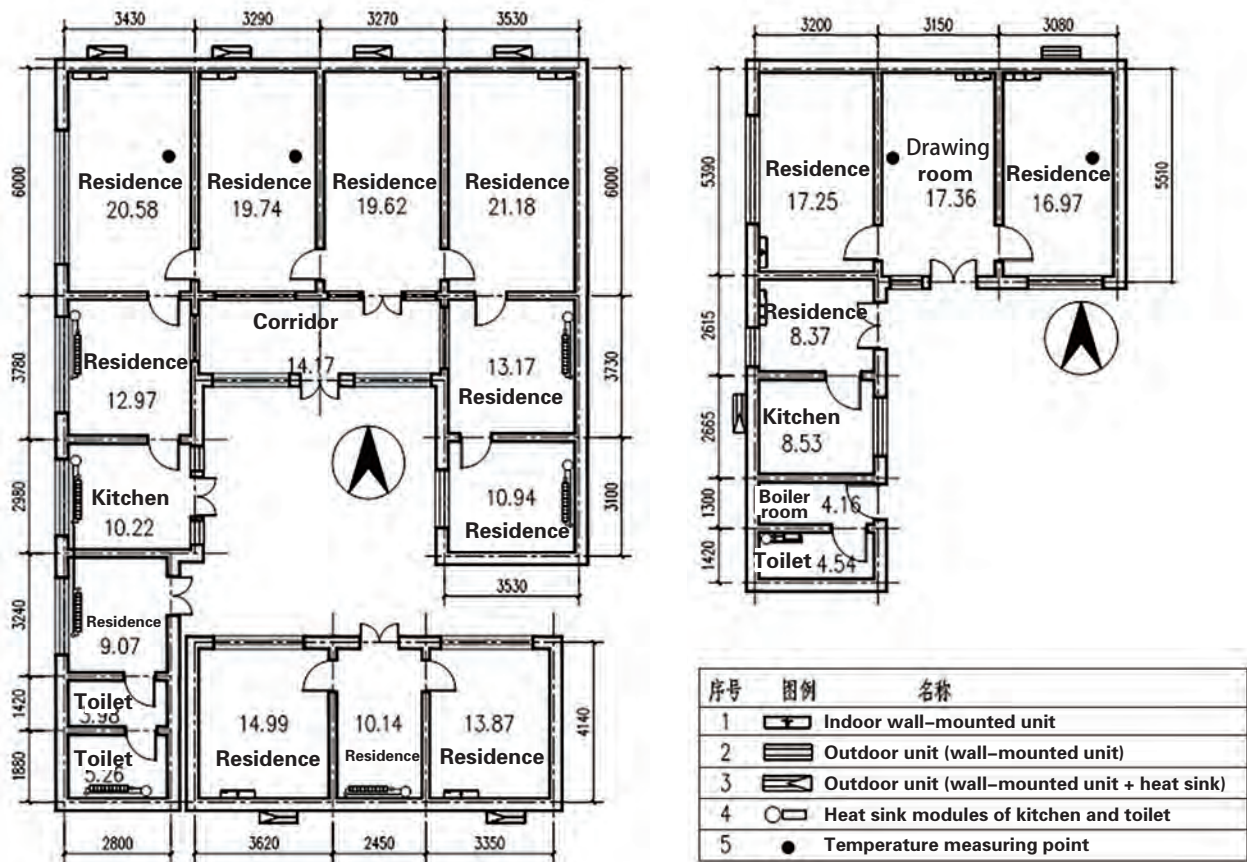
Schematic Diagram of Plane Layout of Building in the Case (Left I and Right II)
